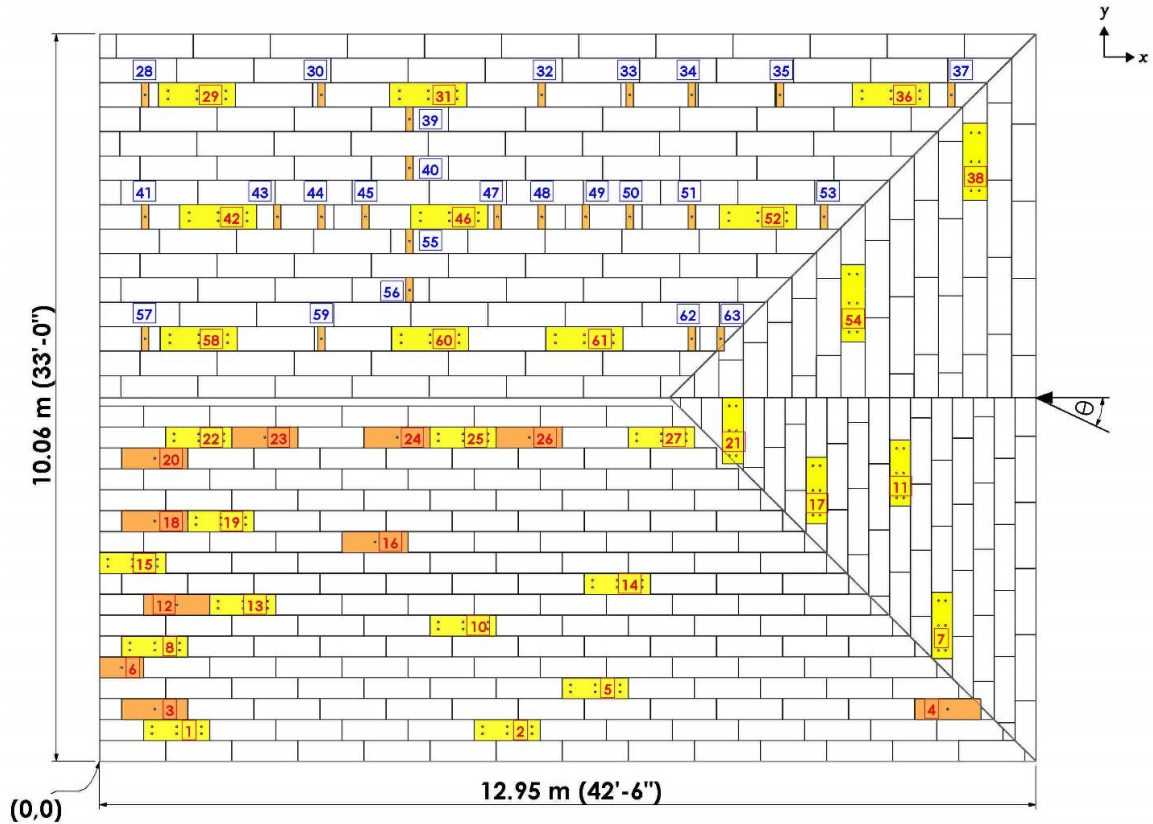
Layout of instrumented panels and measurement locations for both metal cladding products.
